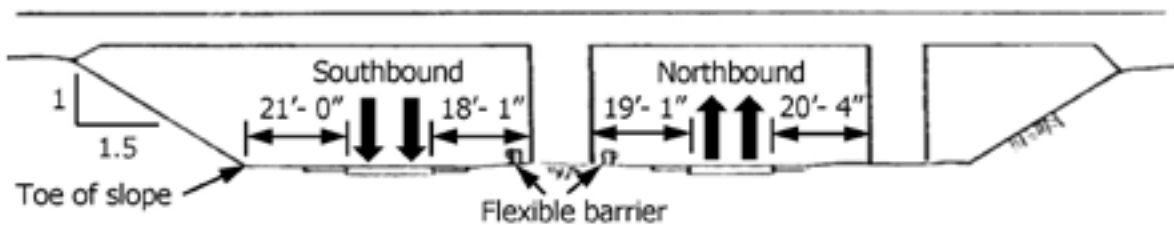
Bridge elevation view of horizontal clearances for separate southbound and northbound highway features below the bridge, with flexible barriers.
